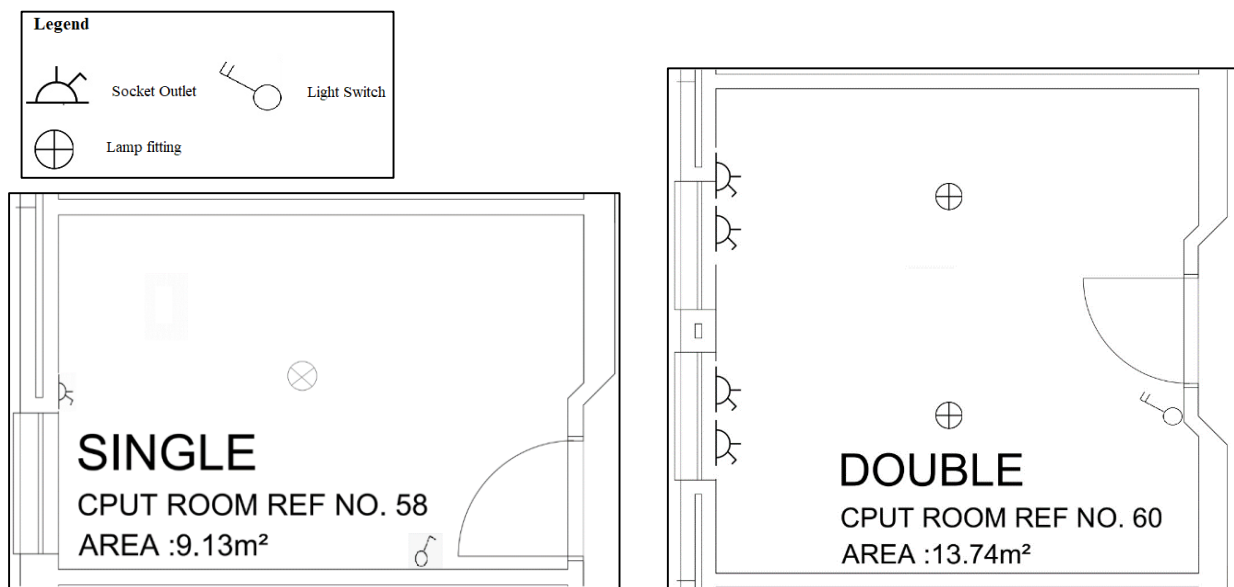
Single and Double room layout at Catsville (CPUT, 2019)
